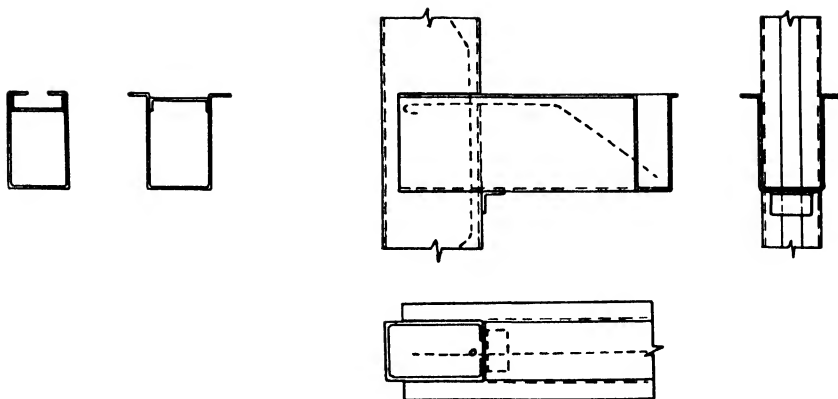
HOLLOW PRESSED STEEL MEMBERS FOR COMPOSITE STEEL AND CONCRETE CONSTRUCTION
